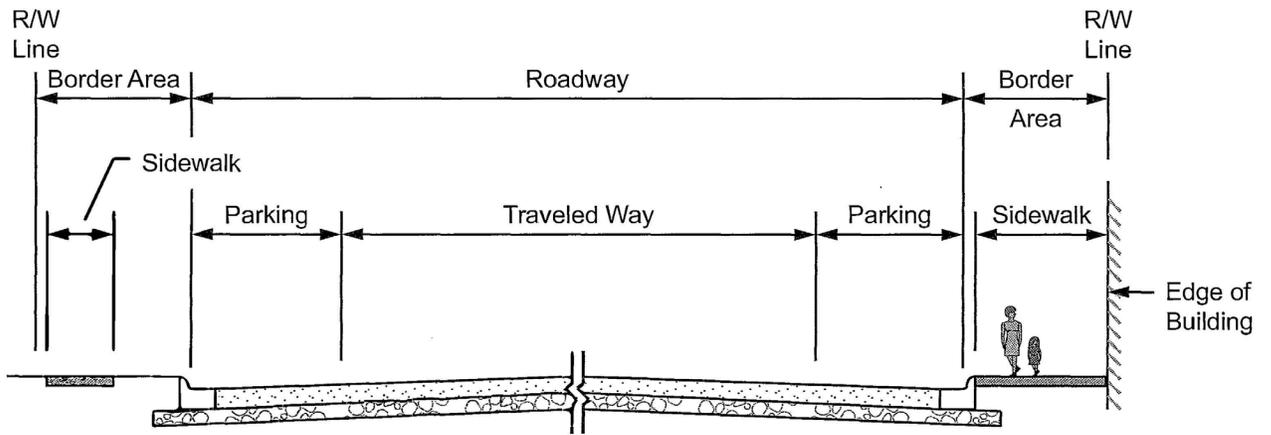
Urban Area with On-Street Parking and Sidewalks
